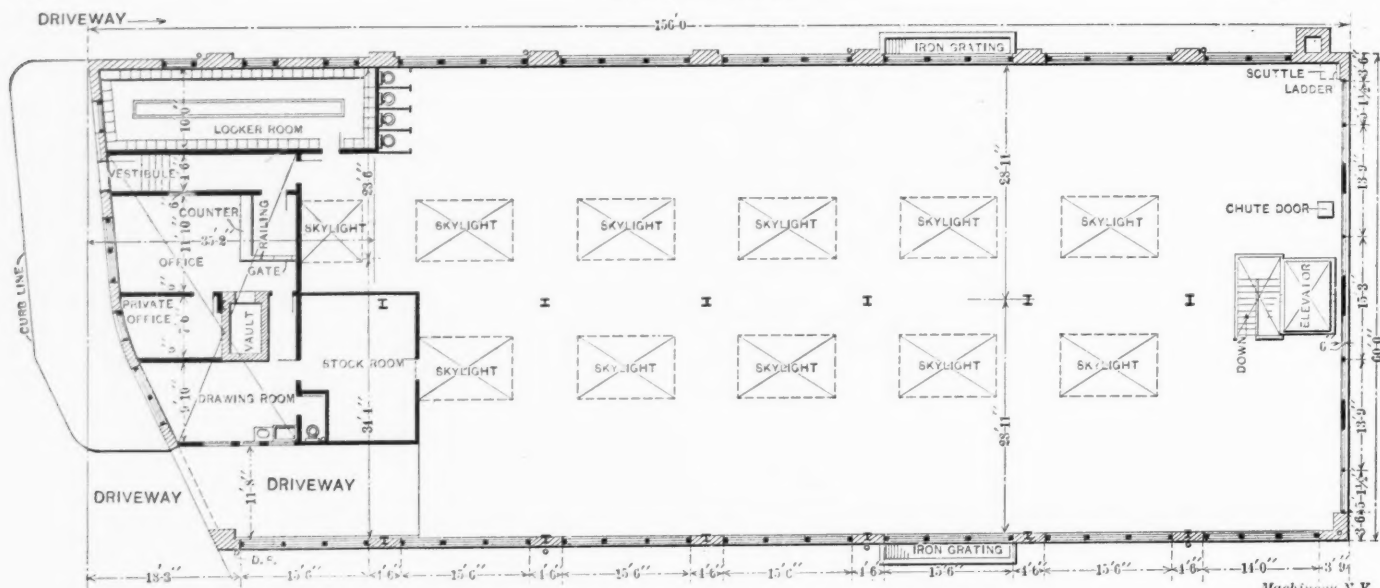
Plan of the First Floor of The Mueller Machine Tool Co.'s Shop, Cincinnati, Ohio.
